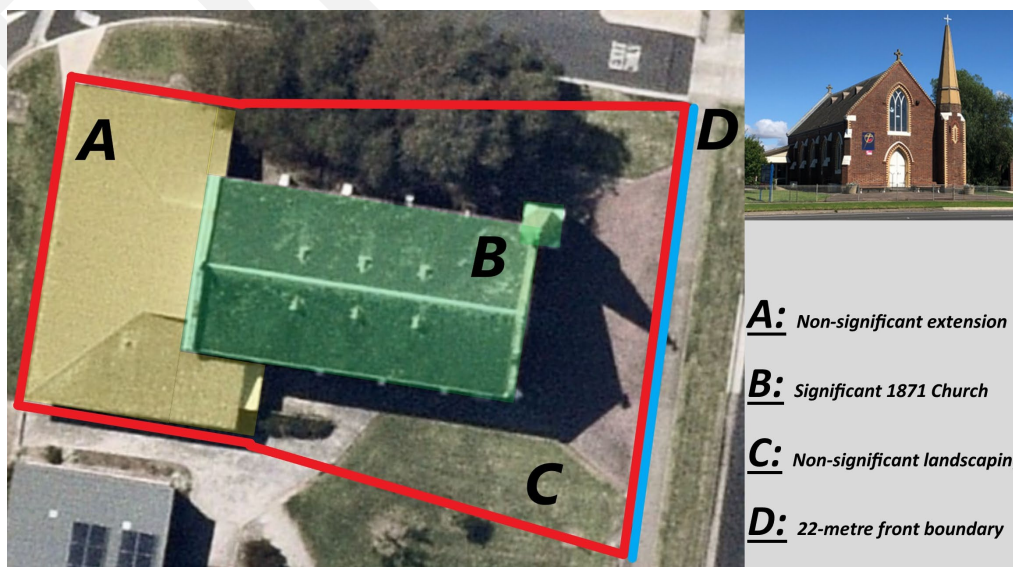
Significance grading plan of St Paul’s Lutheran Church at Grovedale. Source: Nearmap, 2025
